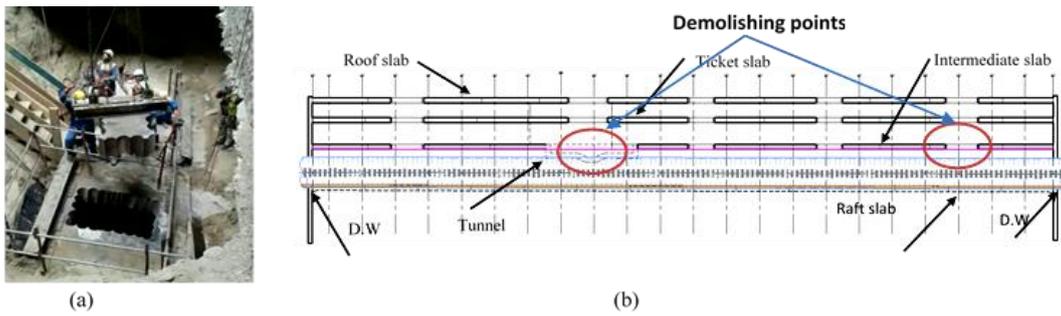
(a) Making a small opening in the tunnel, (b) Sectional elevation at the station and the tunnel demolishing part.
